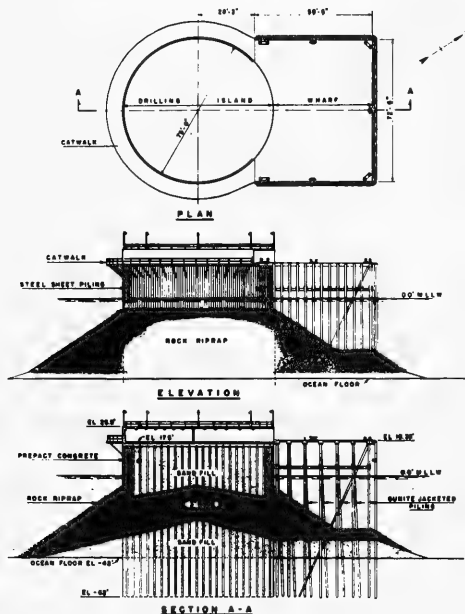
Plan and cross-sectional drawing of filled island (Pyles, 1955).
